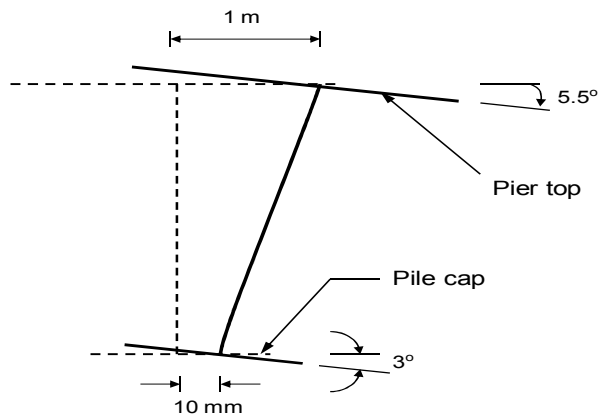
Fundamental mode shape of a typical pile-pier system of the Yanagizawa Bridge (not in scale)
